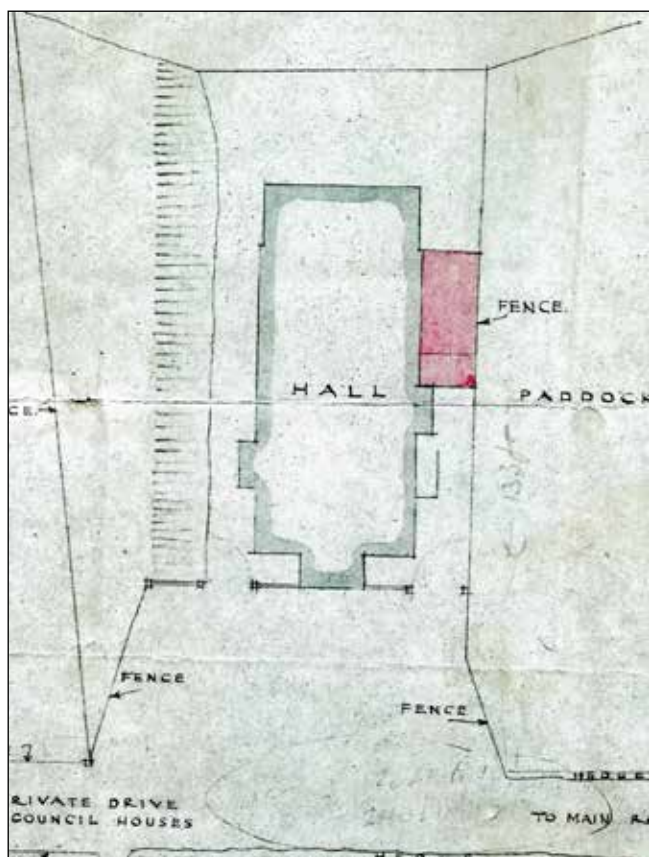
Plan showing location of SCC kitchen in relation to the village hall boundary.
